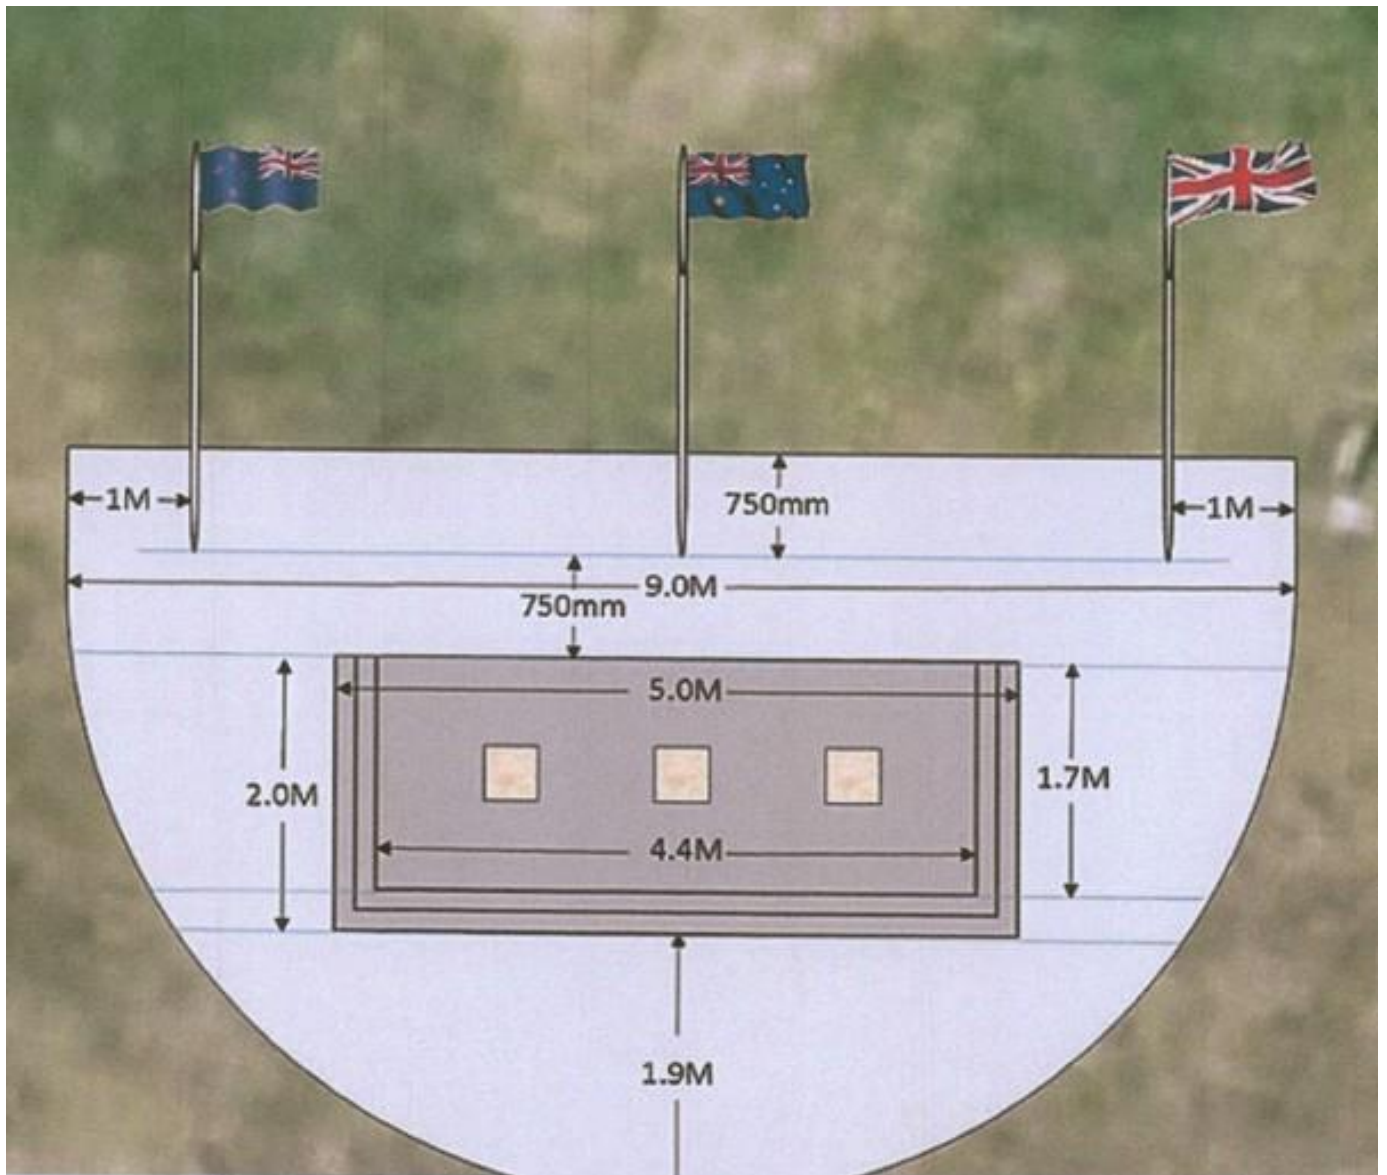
Design and Dimensions plan of proposed RSL Memorial – Birds-eye View
